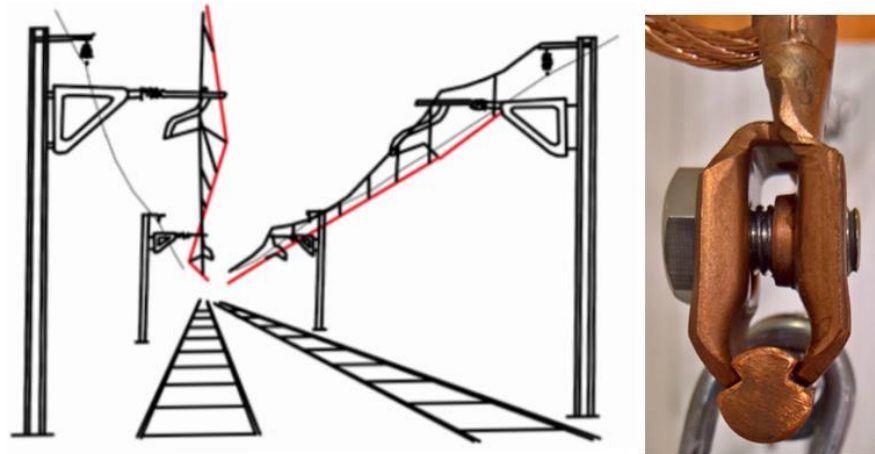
Contact wire staggering and grooved contact wire [44], [37].
